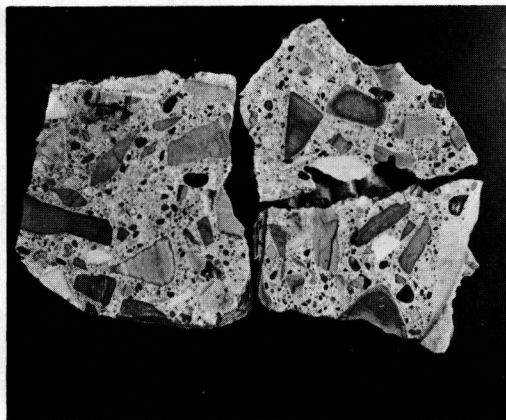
Sections of distressed concrete showing inner and outer rims about coarse Rapid aggregate.
